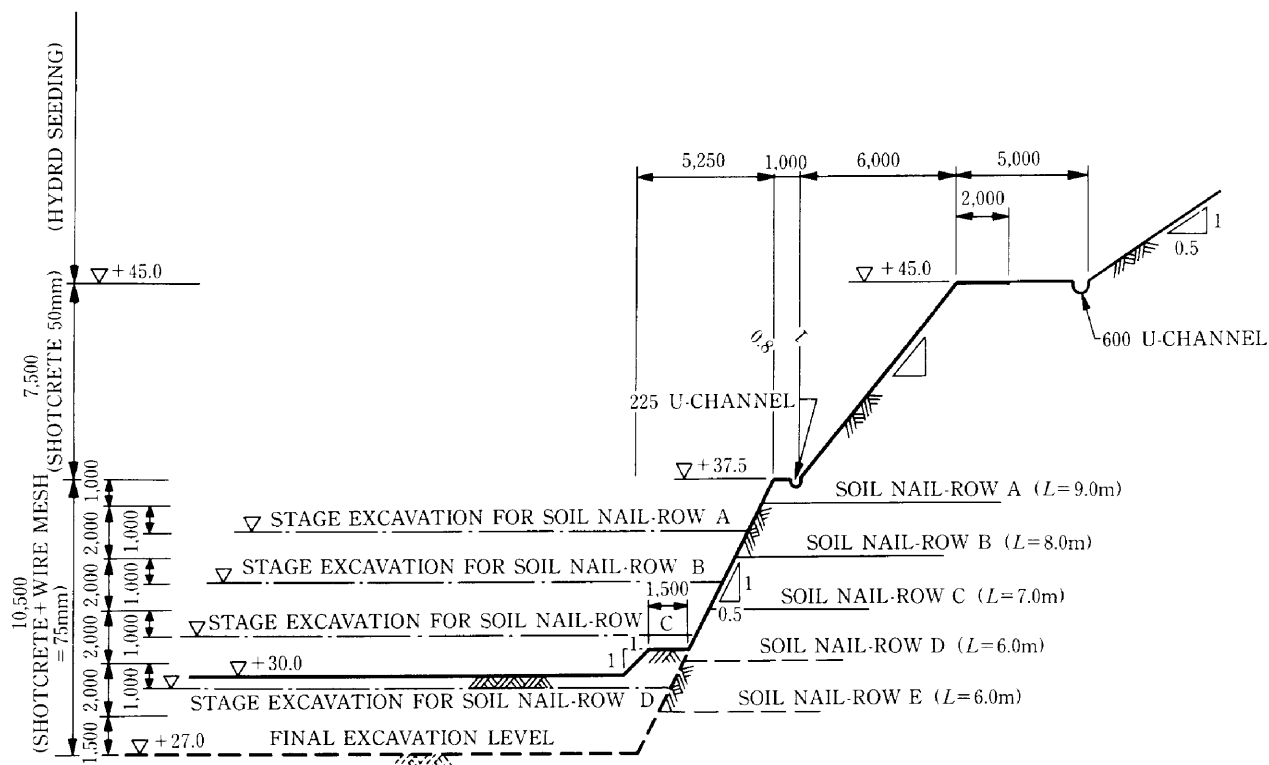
REINFORCED SLOPE WITH SOIL NAIL-ELEVATION
